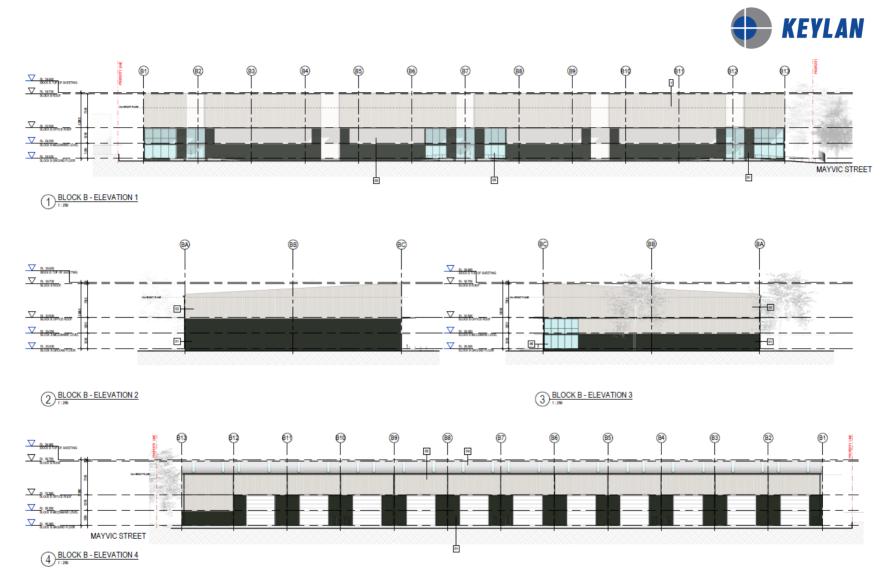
Warehouse B elevation showing proposed building height compared with existing 12m height control (Source: Group GSA)
